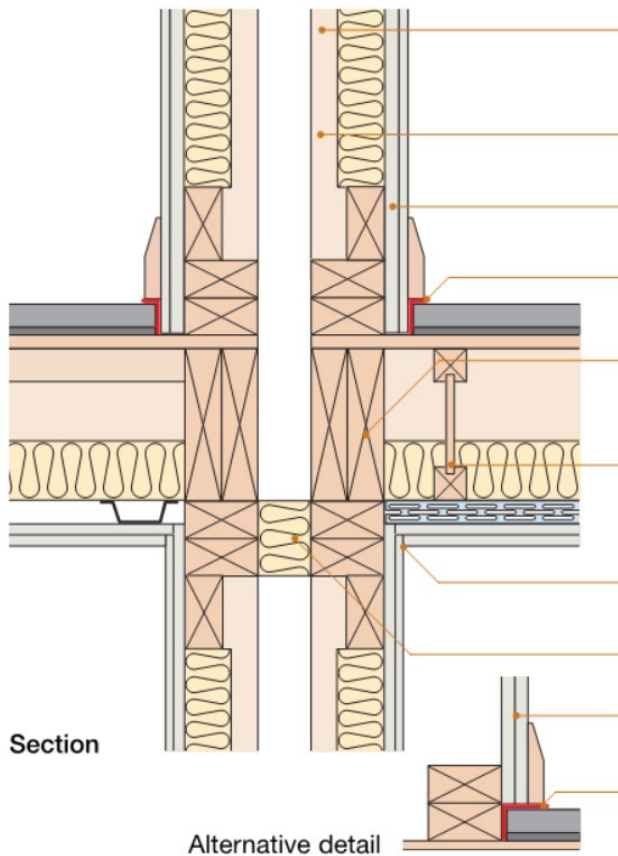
Separating Wall to Separating Floor Indicative Junction Detailing
